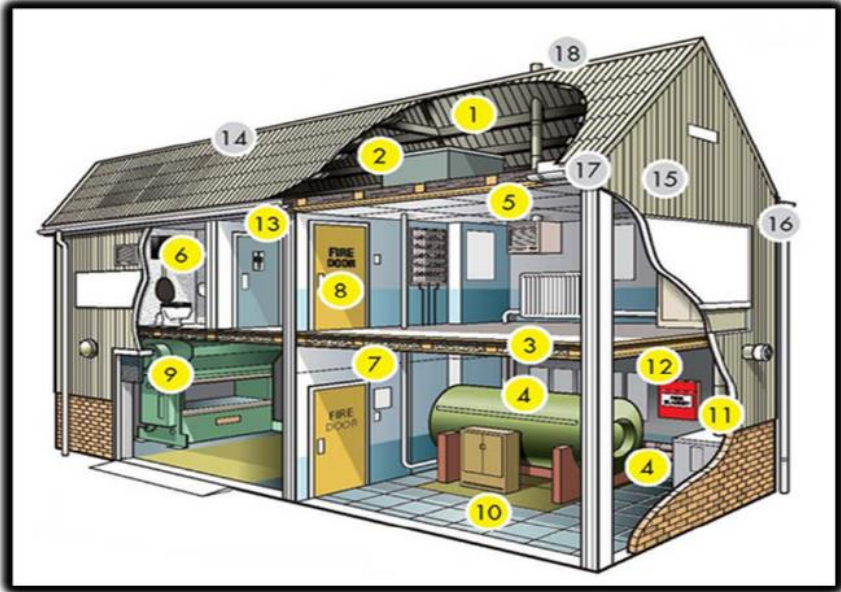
Asbestos spots that can be encountered in a building (Vonka Asbest, 2021c)
